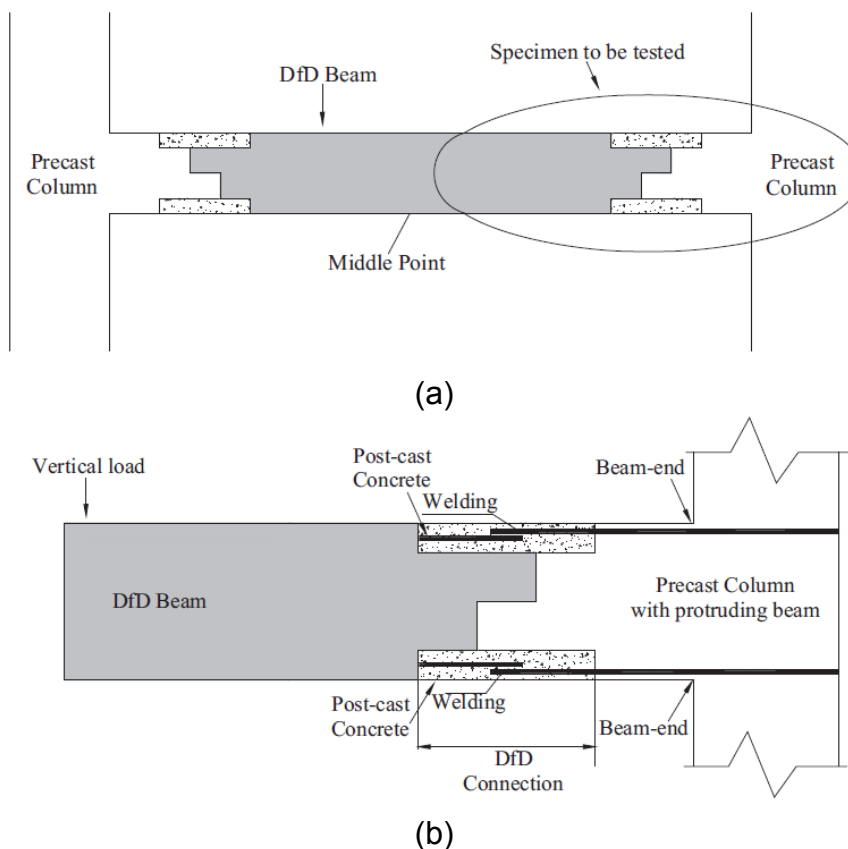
(a) Specimen and (b) details of proposed DfD concrete connection tested [45]
